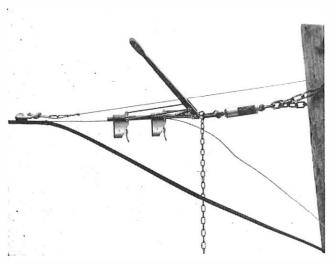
Arrangement for final tensioning showing the towline and cam-type grip, the Tirfor tensioner and Piab dynamometer
